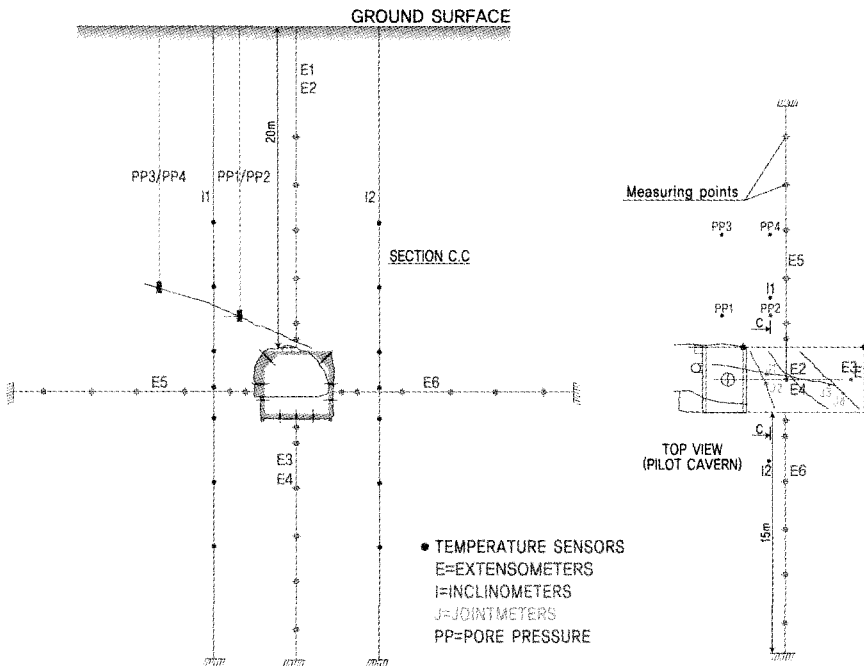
General arrangement of geotechnical instrument in Daejeon LNG Pilot.
